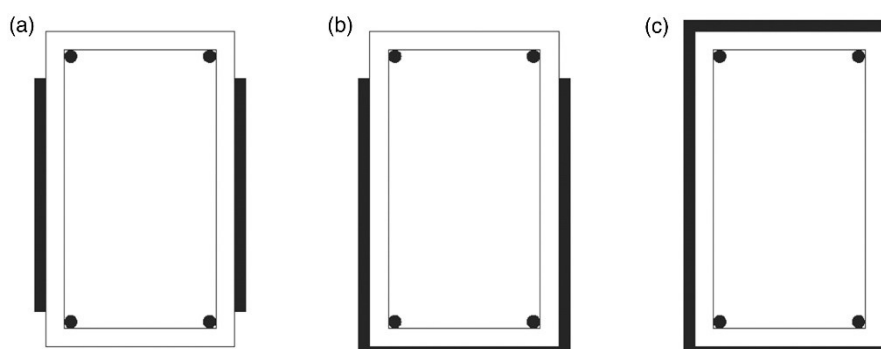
Diagram of side bonded (a), U-jacketed (b) and wrapped (c) reinforcement [25]
